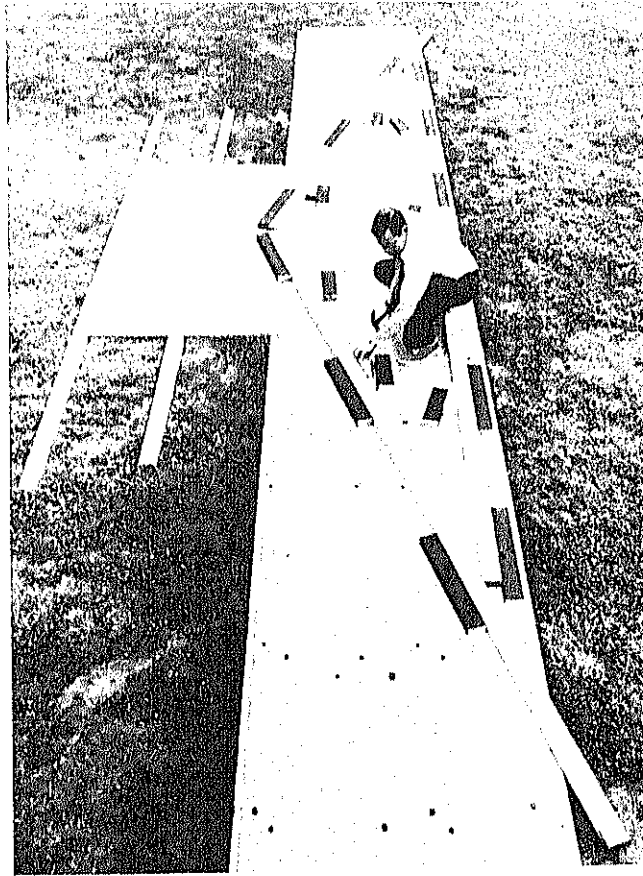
Photograph of blocks and wedges being inserted to straighten truss members until truss shape has been fixed by nailing gussets and braces to it.
